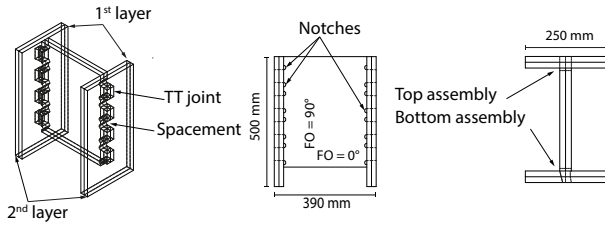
Sample geometry (a) Axonometry (b) Side view (c) Top view
